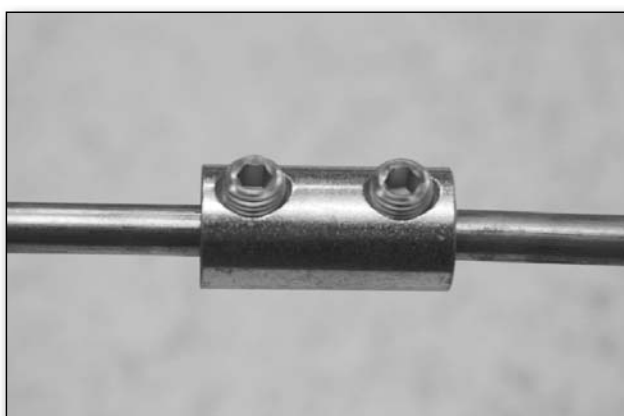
Using a CB-10 (not pictured) or CB-12 (pictured) Universal connector bolt, two sections of Snake Tray are joined together
